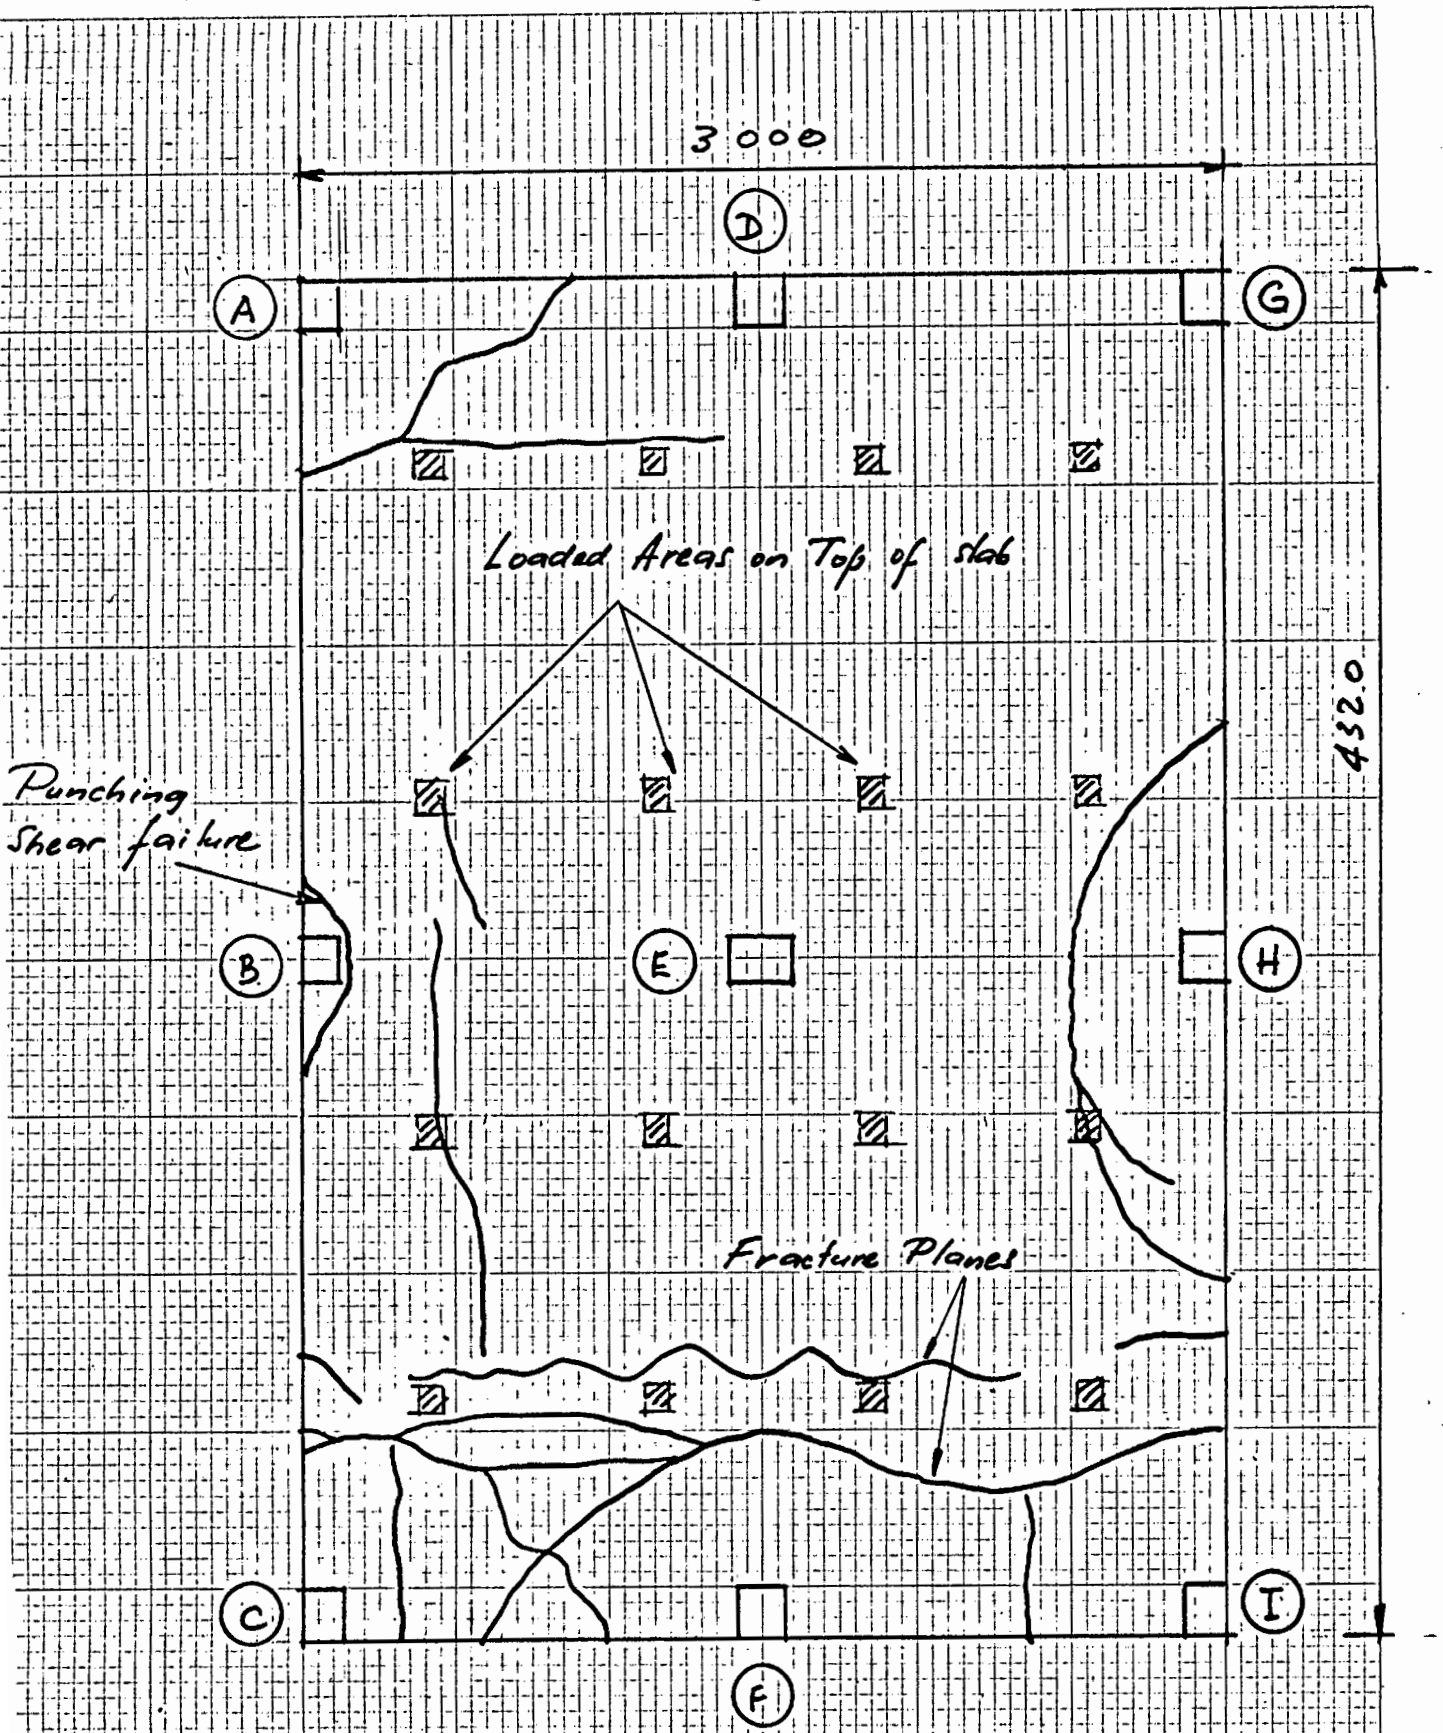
CRACK PATTERN IN BOTTOM OF SLAB
